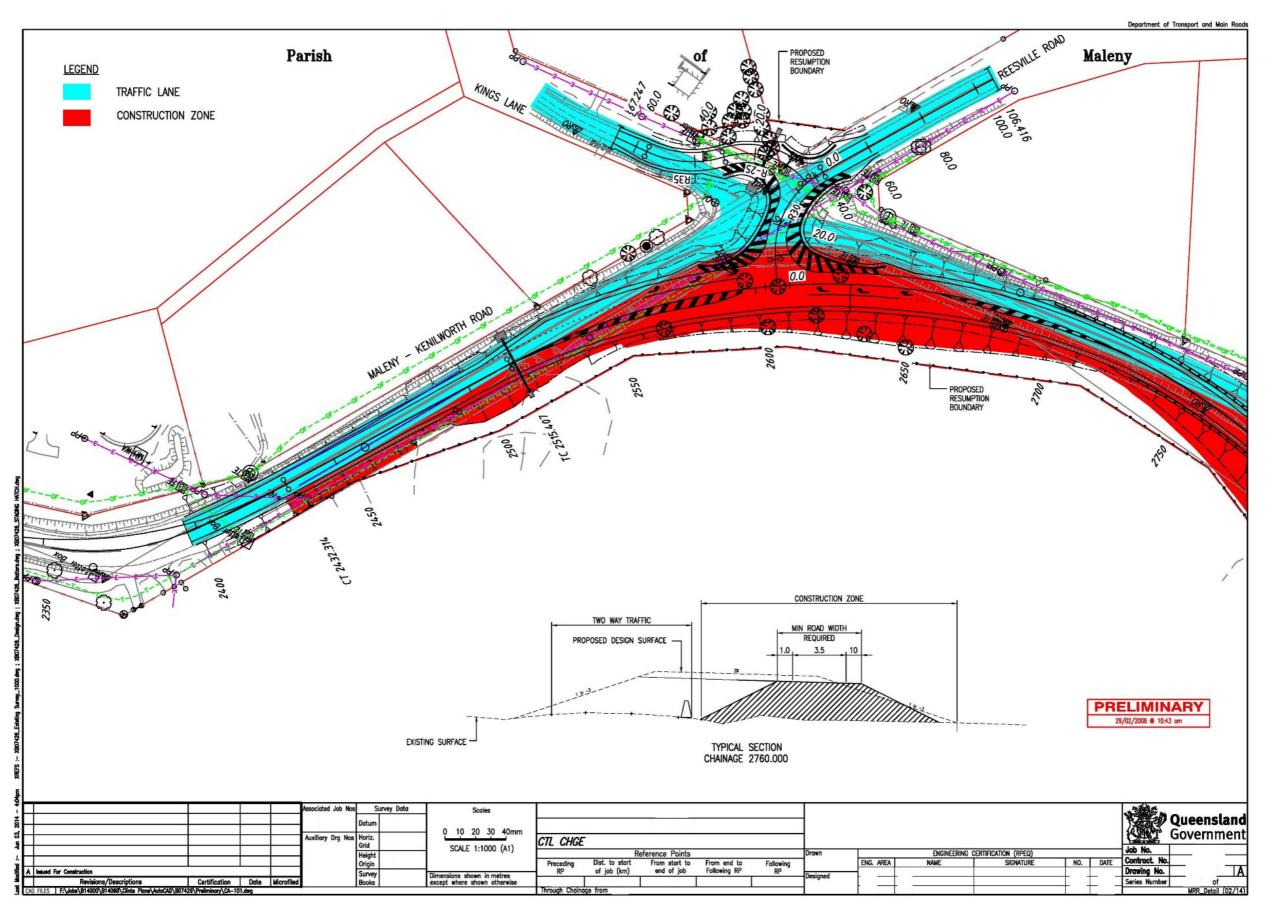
(b) – Construction staging – generic example 1 – sheet 2 of 2
